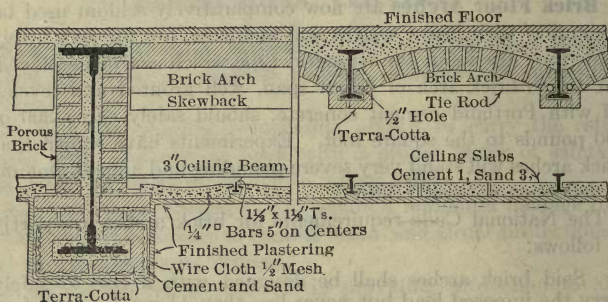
Brick Arch Construction in United States Printing Office, Washington, D. C.
